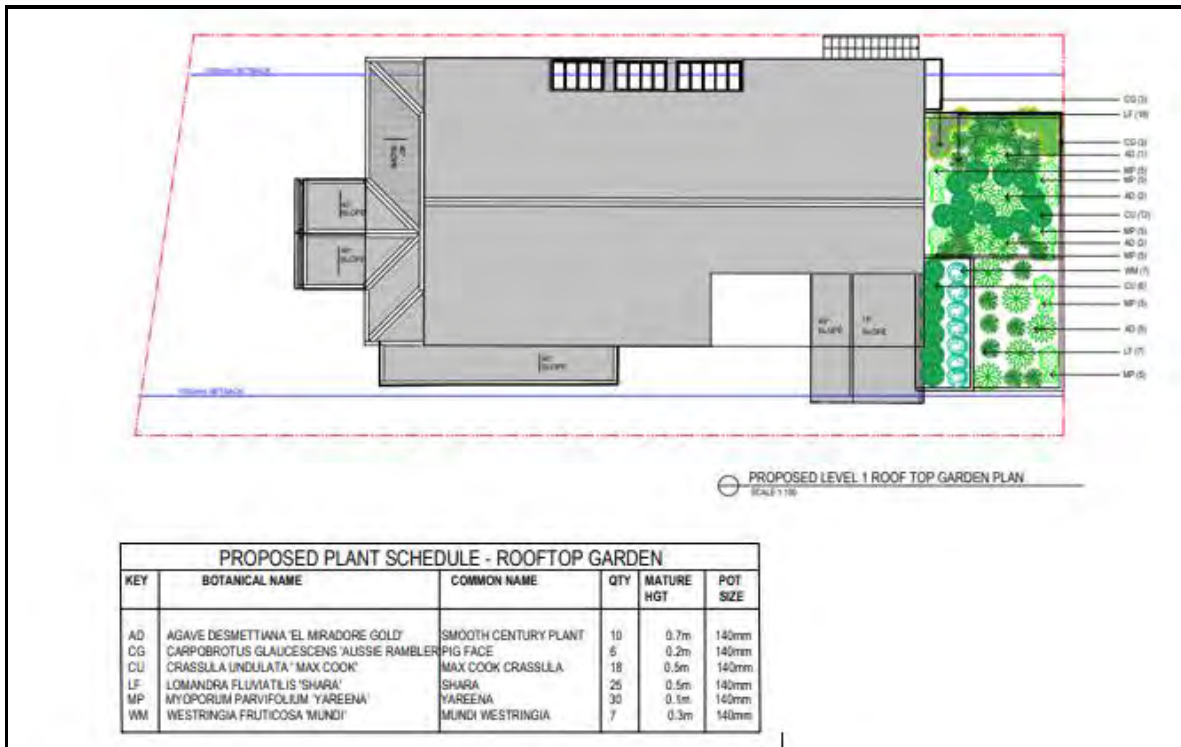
Proposed Level 1 Roof Garden, Landscape Plan L-02 Rev C
